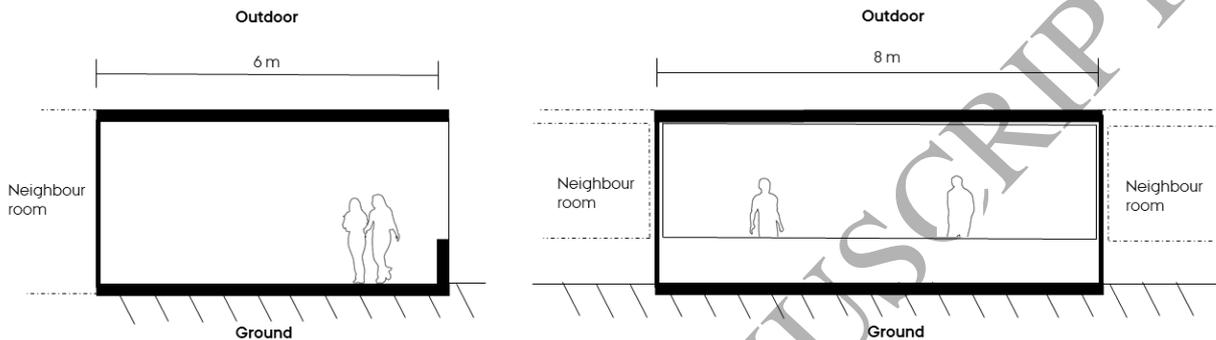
Internal dimensions and boundary conditions for the office building zone. Left: Vertical section of the zone. Right: Front elevation of the façade. The walls facing neighbour rooms are assumed adiabatic.
